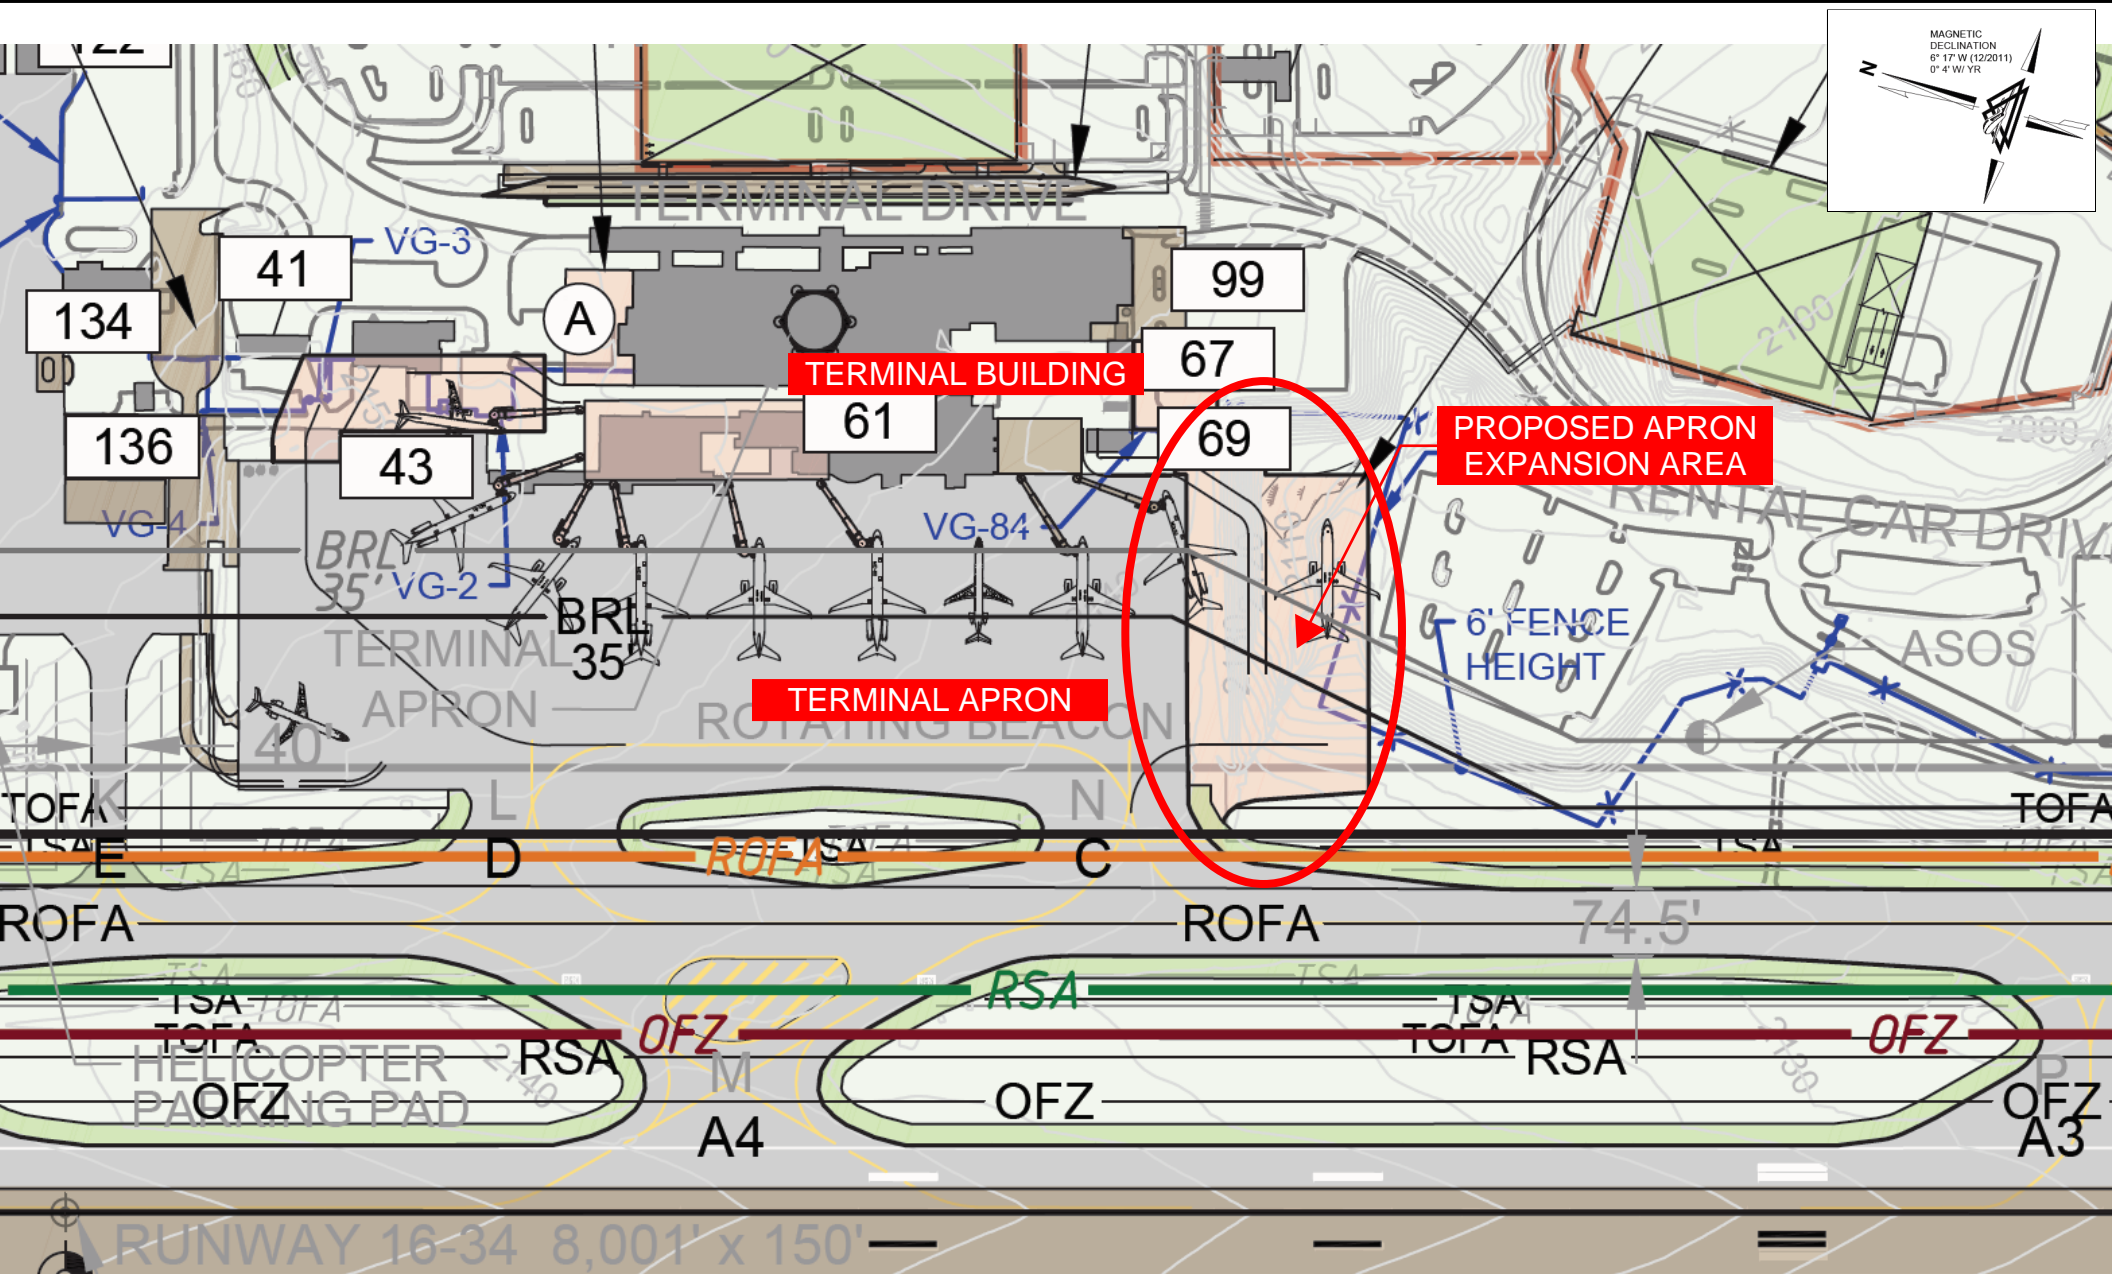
Excerpt from Approved Airport Layout Plan (ALP)
